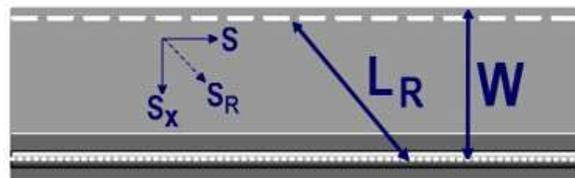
Pavement geometry parameters, (Plan view of a typical pavement surface)
